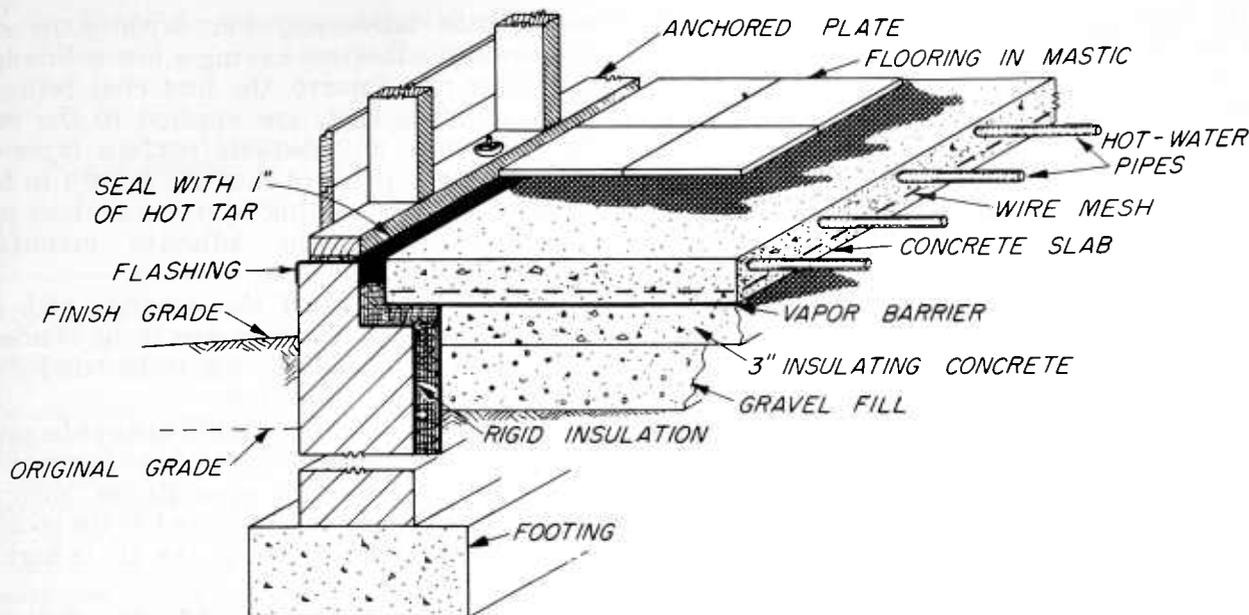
Independent concrete floor slab and concrete walls. Radiant-heating pipes are embedded in the floor.
